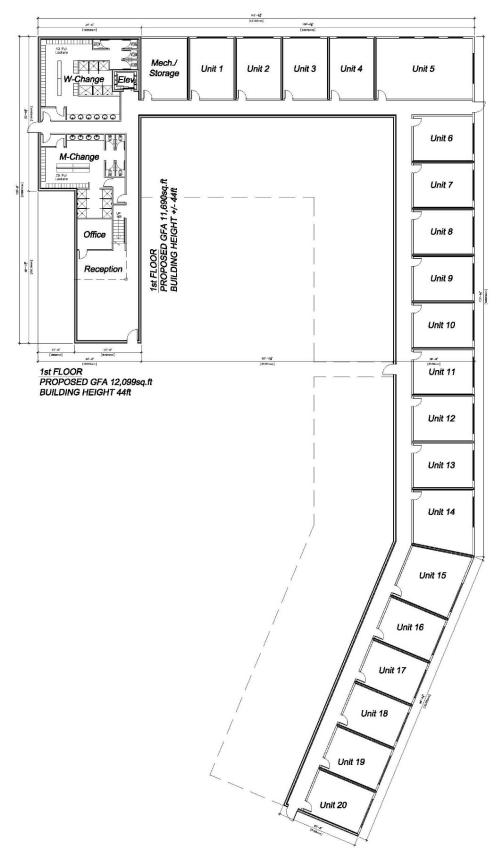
Ground Floor Plan, Inn and Spa Building (Source: BPE Developments)
